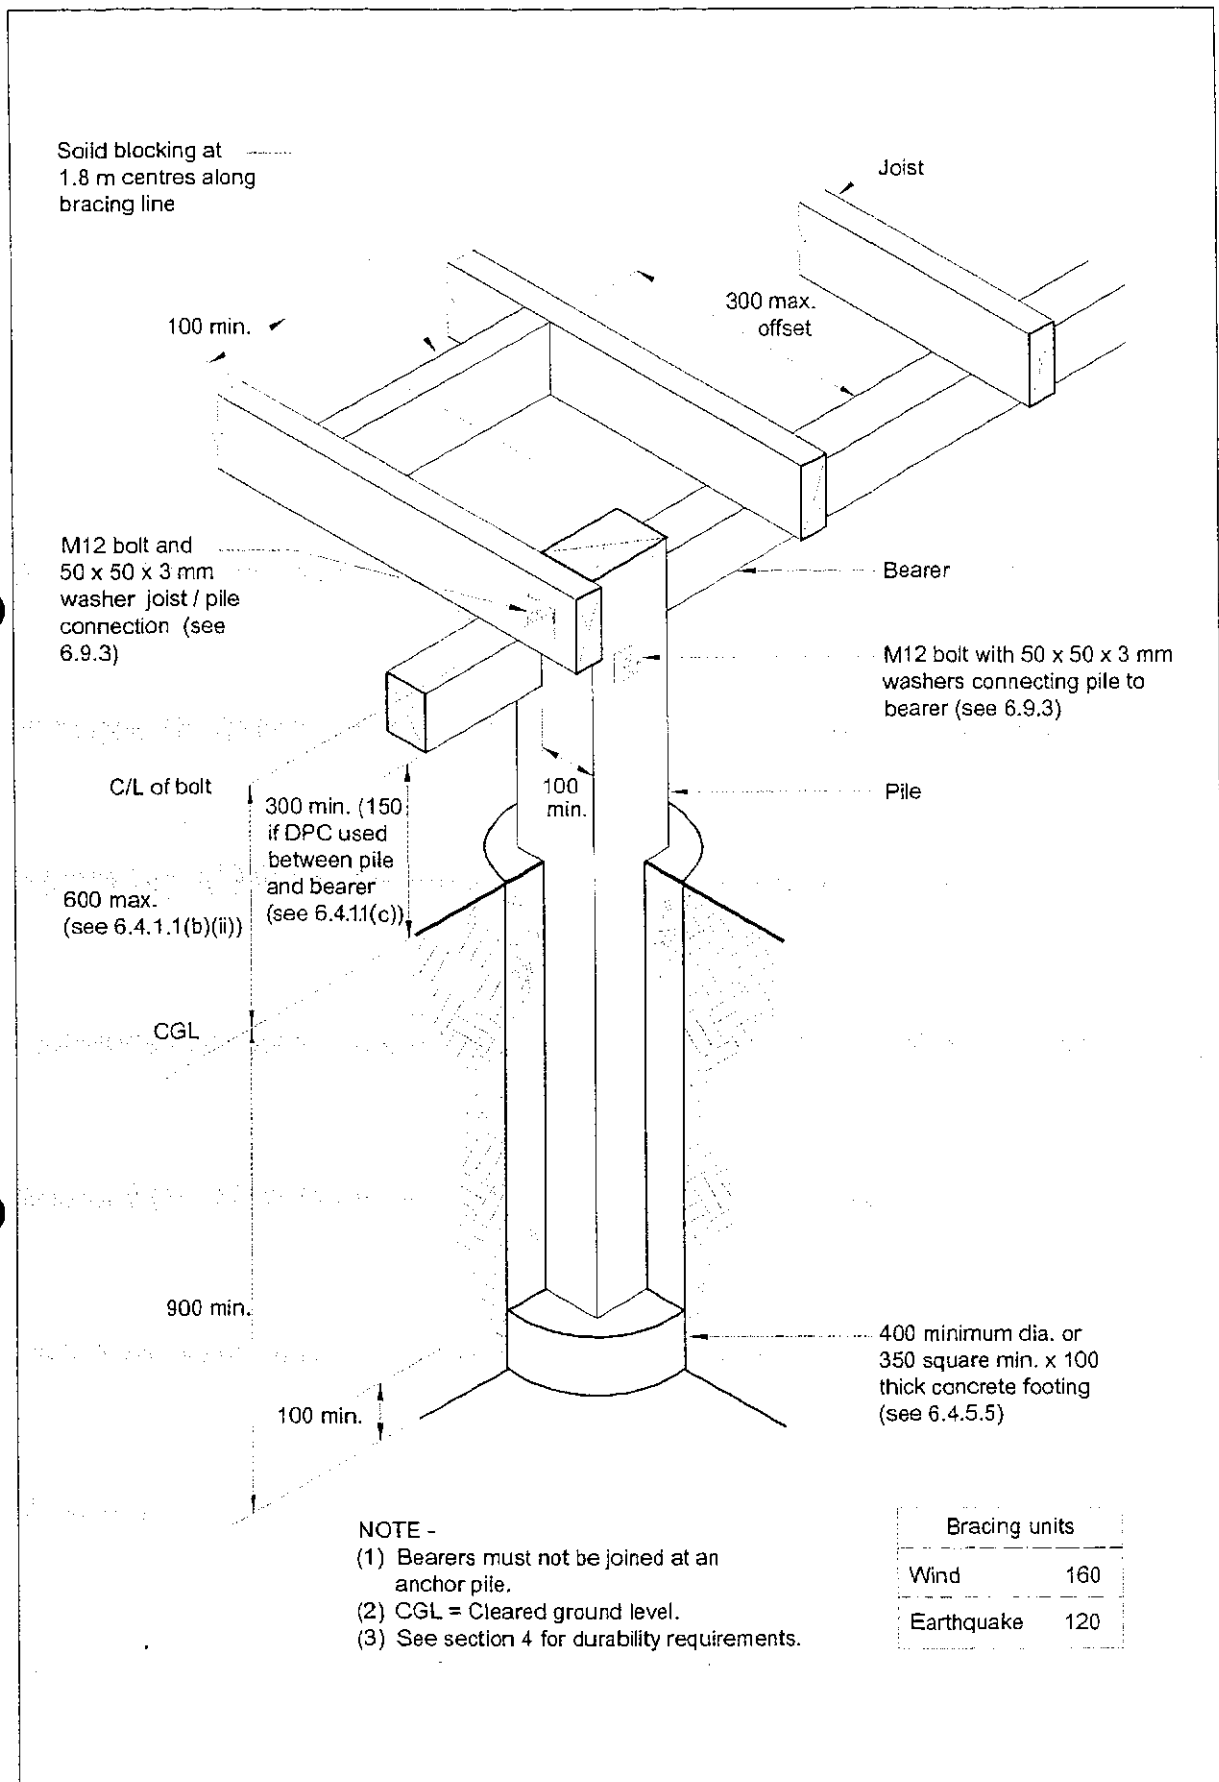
Anchor pile directly connected to joist and bearer (see 6.9)
